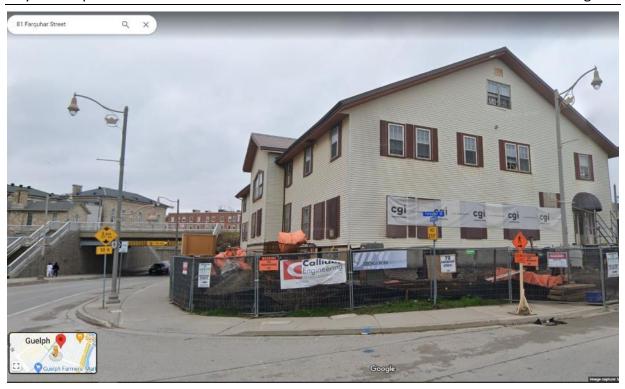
2022 construction outside the designated heritage home at the corner of Wyndam Street south and Farquhar Street in 2022.
